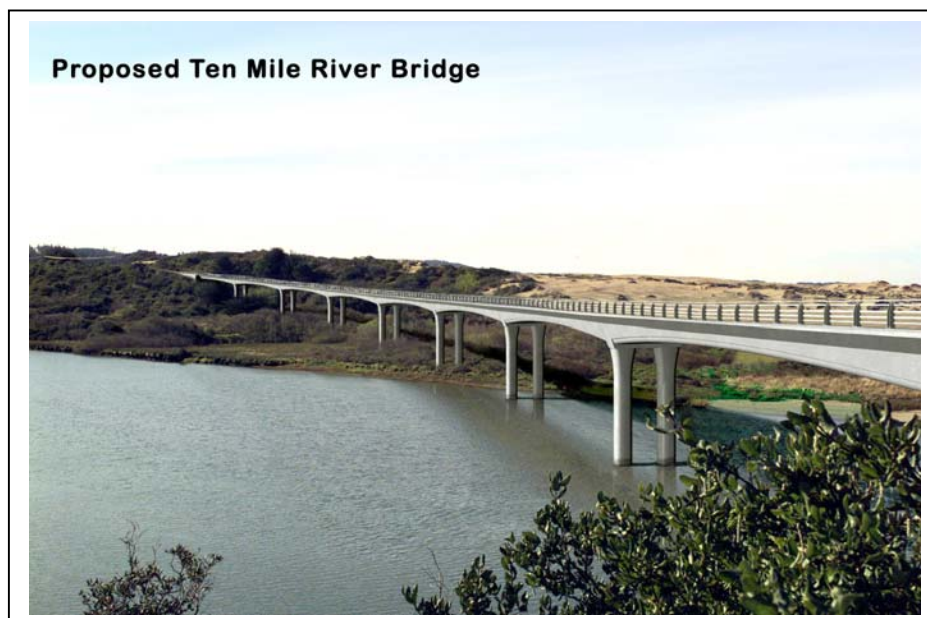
Proposed Bridge Profile (Alternative C and C-SW)
